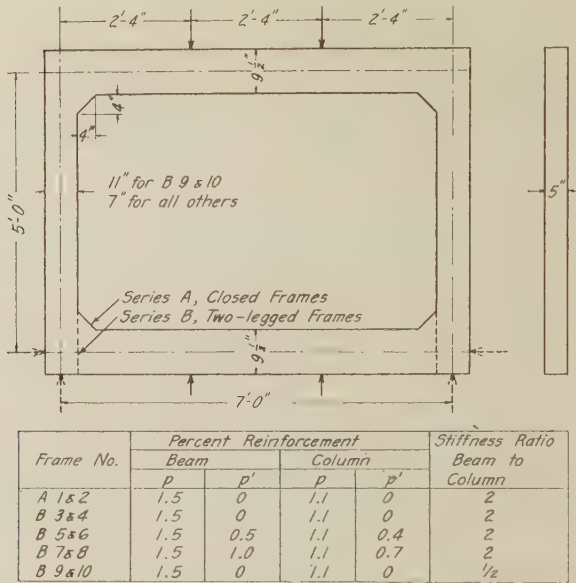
DIMENSIONS AND REINFORCEMENT OF FRAMES
